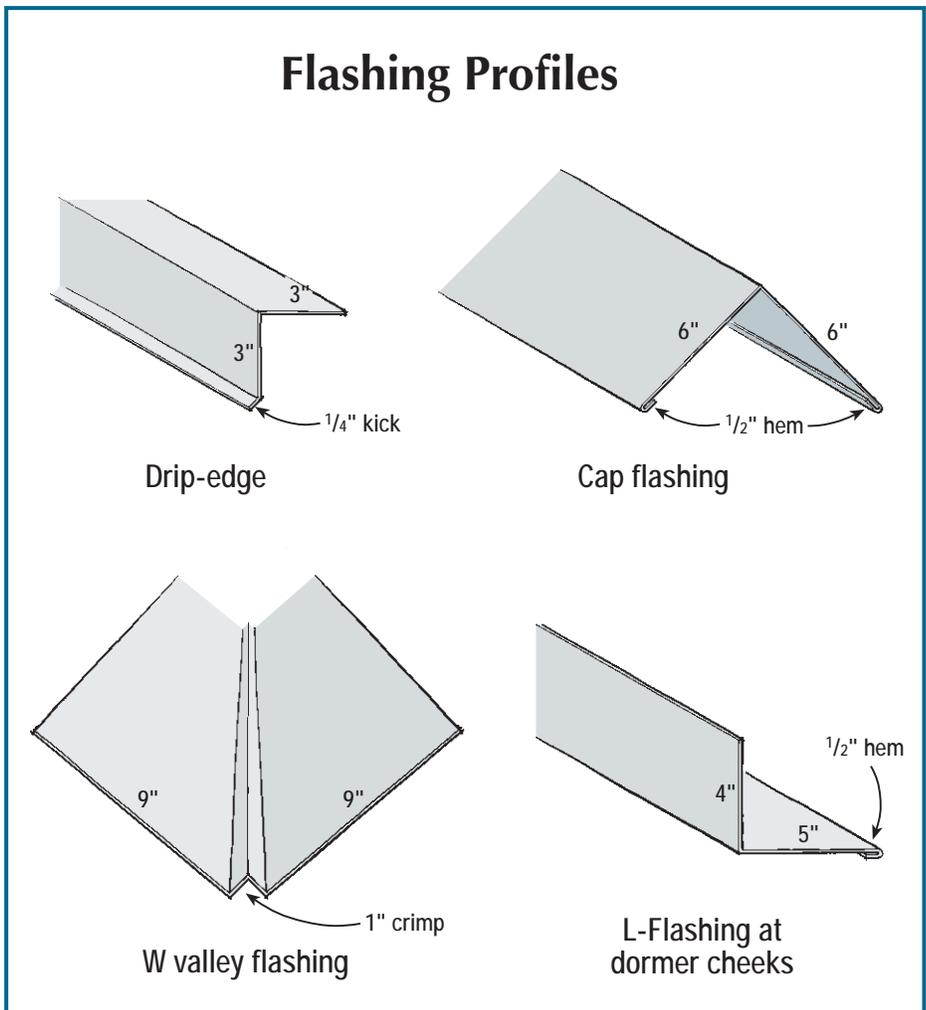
Flashing needs for most roofs can be handled with four simple flashing profiles.
